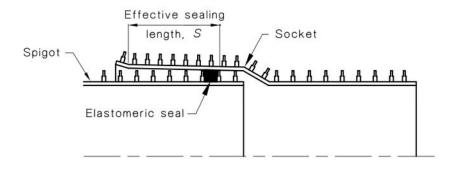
TYPICAL ELASTOMERIC SEAL JOINT ON RIBBED AND PROFILE WALL PIPES AND FITTINGS
